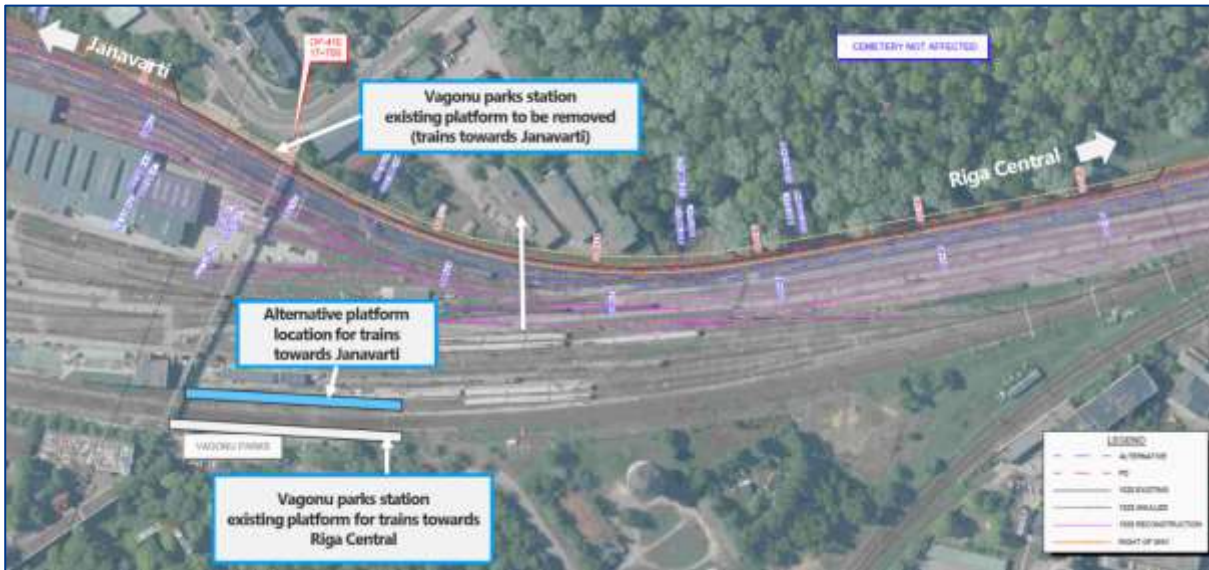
VAGONU PARKS STATION – ALTERNATIVE PLATFORM LOCATION⁴⁵
